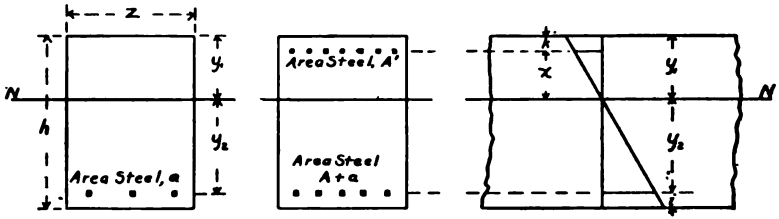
CROSS-SECTION (Single Reinforcement.)
